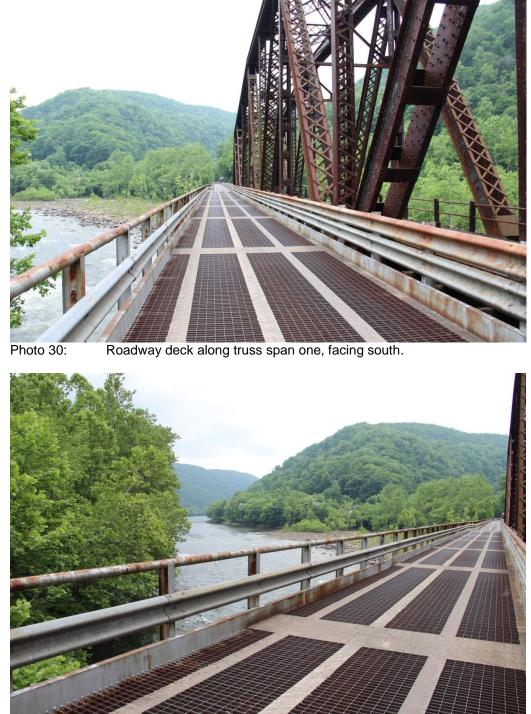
Detail of roadway deck along truss span one showing outer guardrail, facing southeast.
